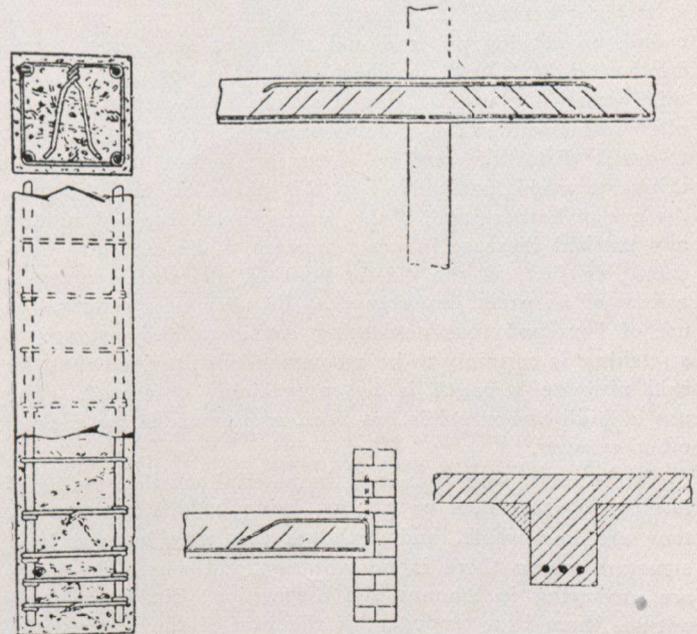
Arrangement of Column Reinforcement with vertical Rods and Loop-pieces.
